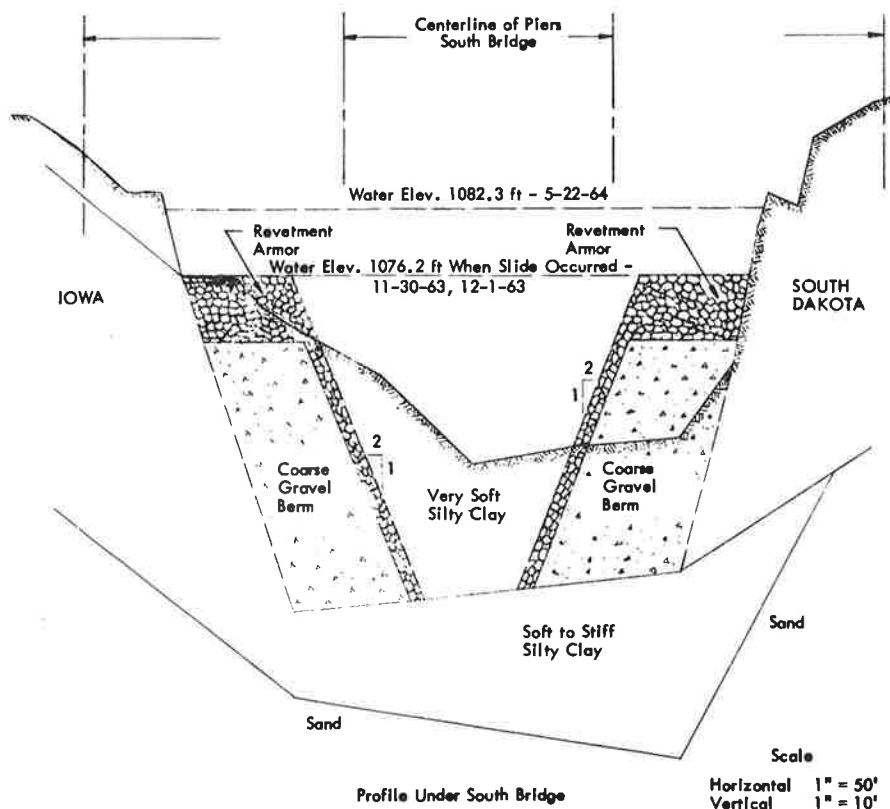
Stabilization proposal of Big Sioux channel for I-29 bridges.
